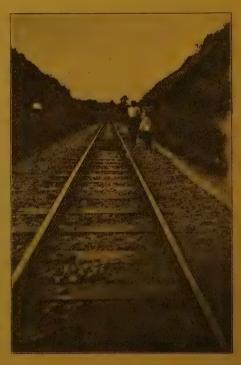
T. P. 4'9/8 main line, 80 lb. rails, 6-bolt angle plates 32 inches long, square joints, restricted expansion.
